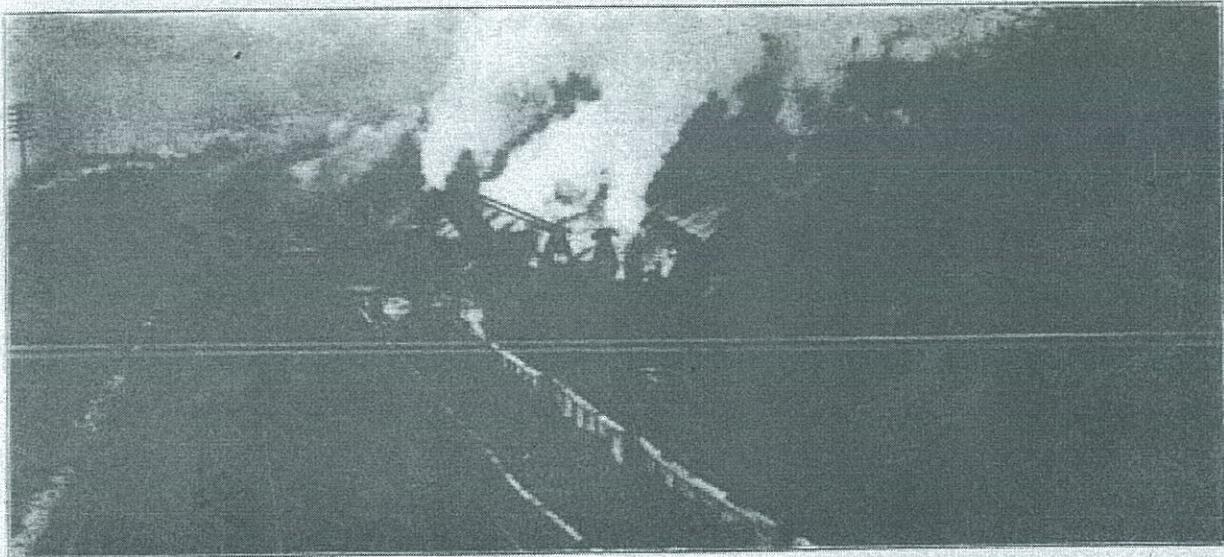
Looking West from Dowling Avenue Bridge, Dec. 1, 1911.
